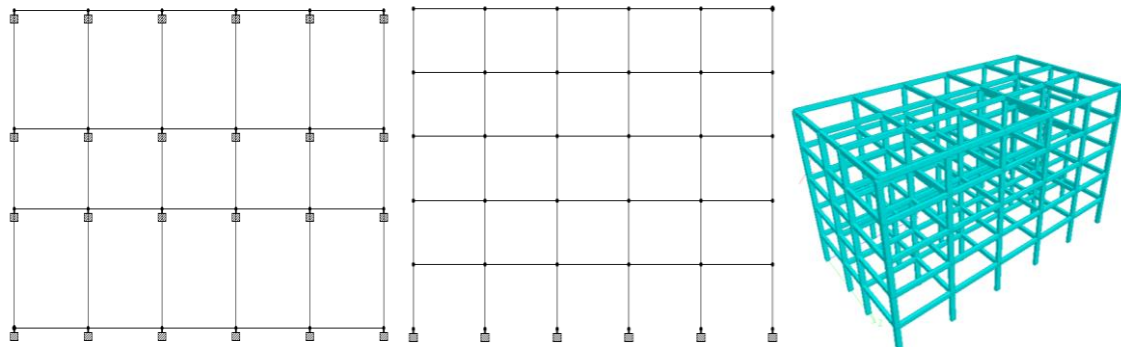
Plan and 3D View of a (G+4) Storey Building Frame Without Shear Walls
